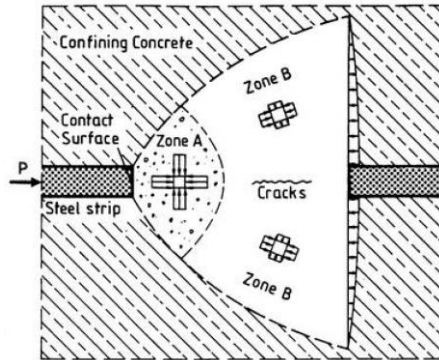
Loading of concrete dowel, Kraus [Kr1997b]
